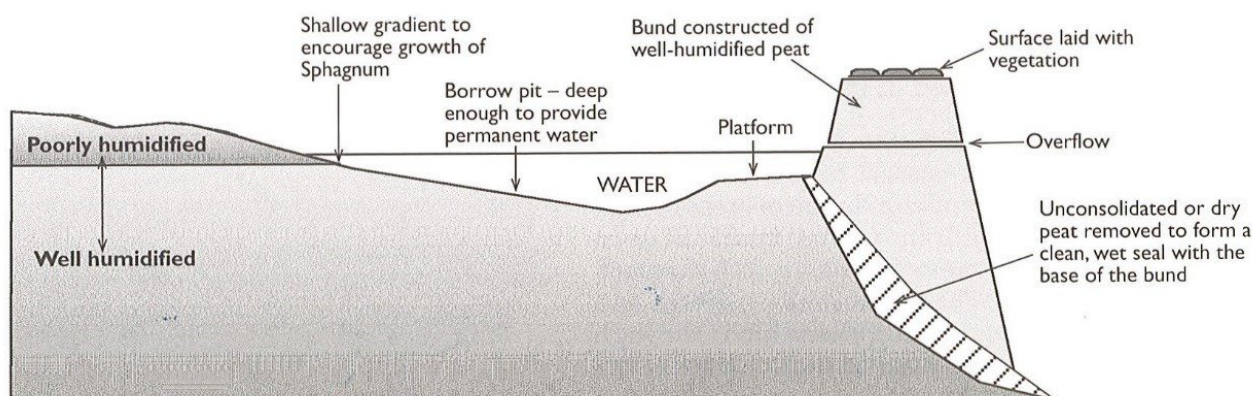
Bund construction showing the layout of the platform and borrow pit.
